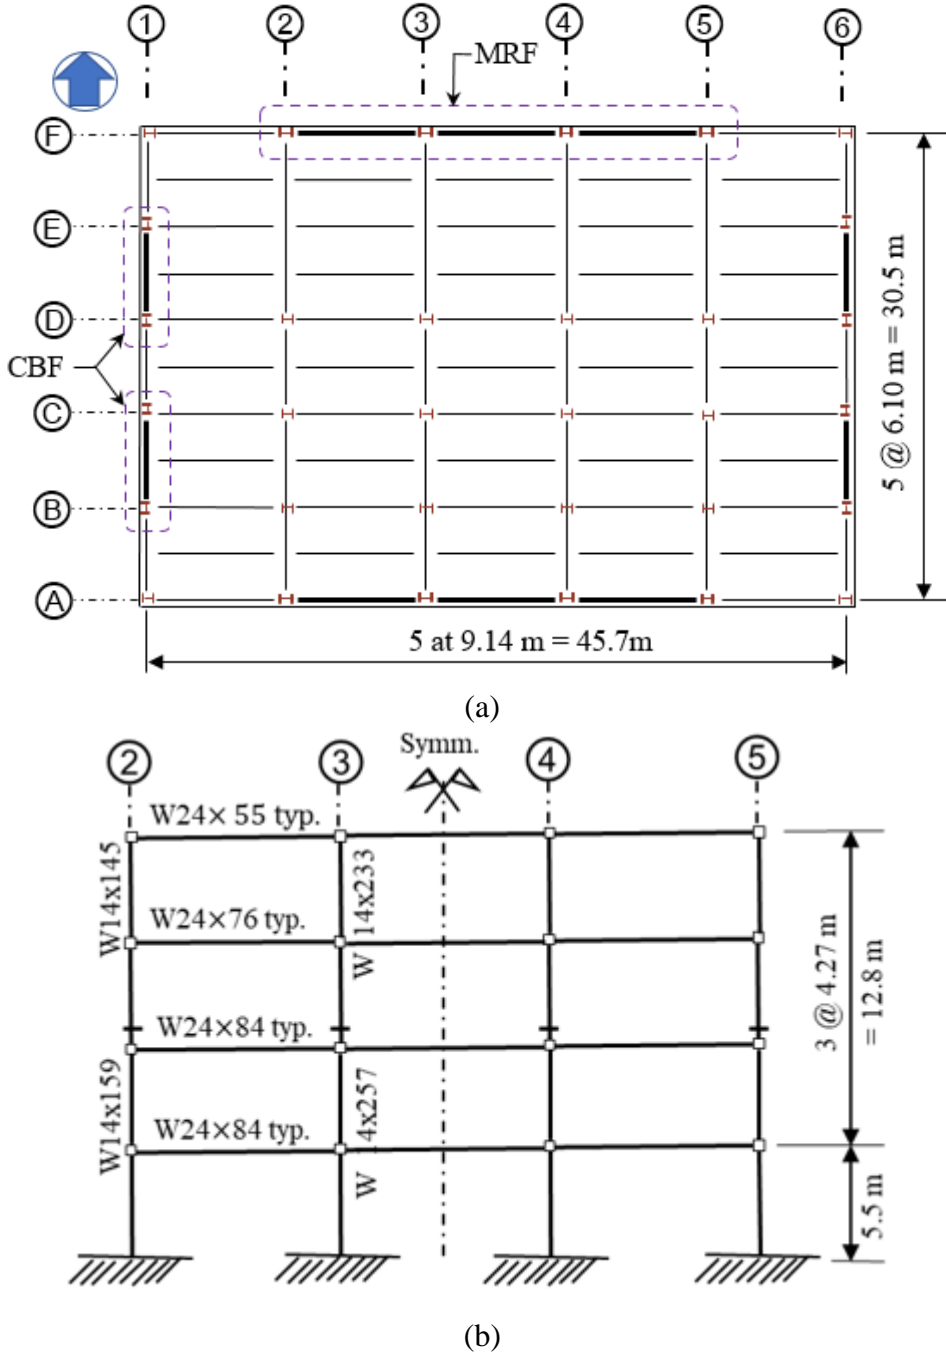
Four-story steel frame building: (a) Floor plan showing the structural framing layout, and (b) Elevation
